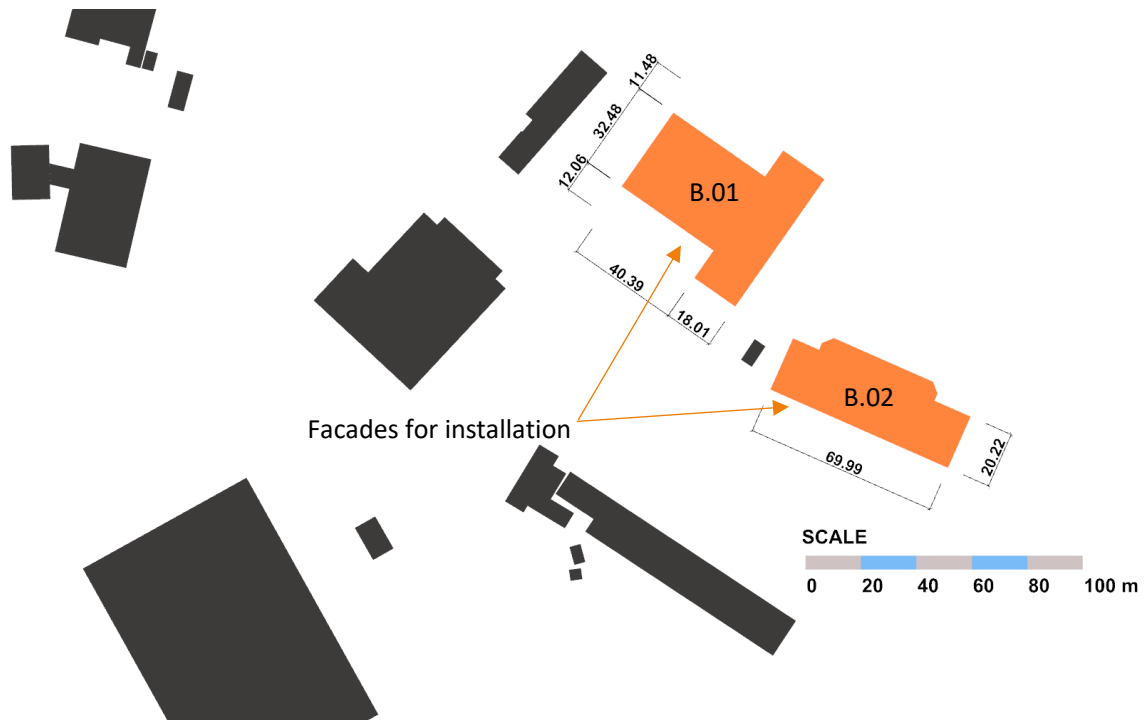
LOCAL SITUATION OF THE ALTERNATIVE 2 DEMO BUILDING
